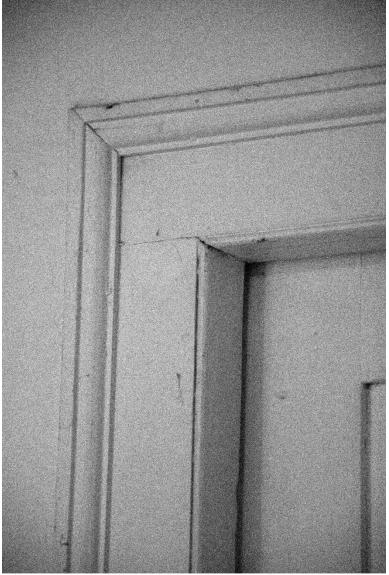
door casing detail, back rooms Reference (file name): PIC_0585
